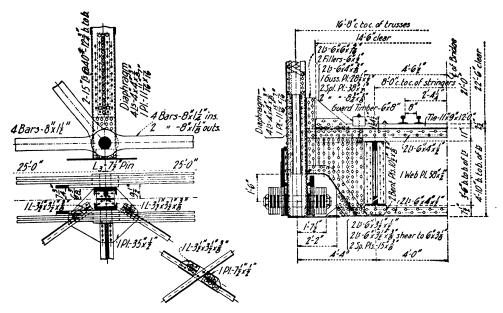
Floorbeam Connection. Northern Pacific R. R.
